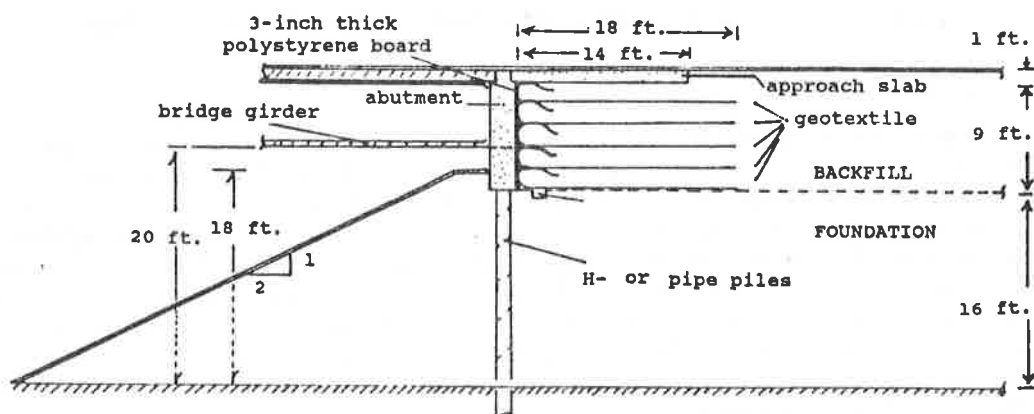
A Typical Geotextile-Reinforced Bridge Abutment.
